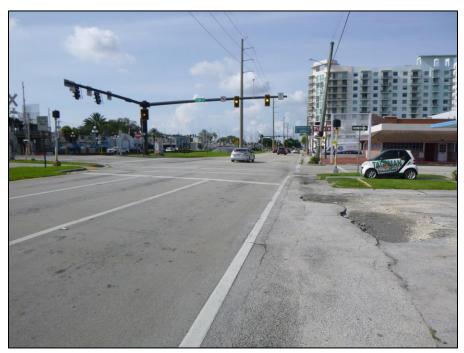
Railroad, Pavement, and Underground Utilities in the Hollywood Station APE near N. Dixie and Polk Street, Facing South
